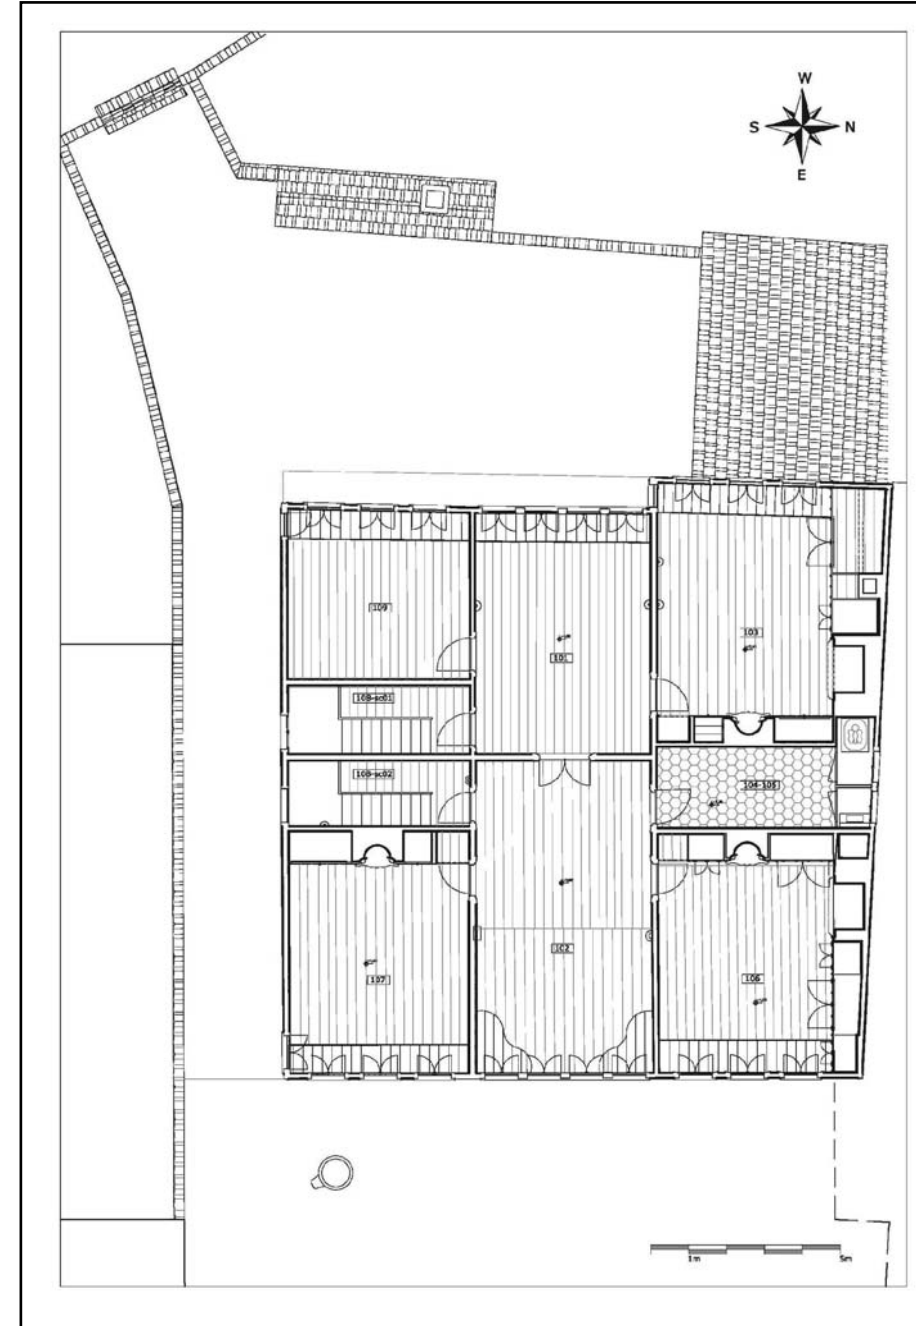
Restitution Phase I – First Floor Plan: 1/200 (Presented in 1/100 at Jury)
